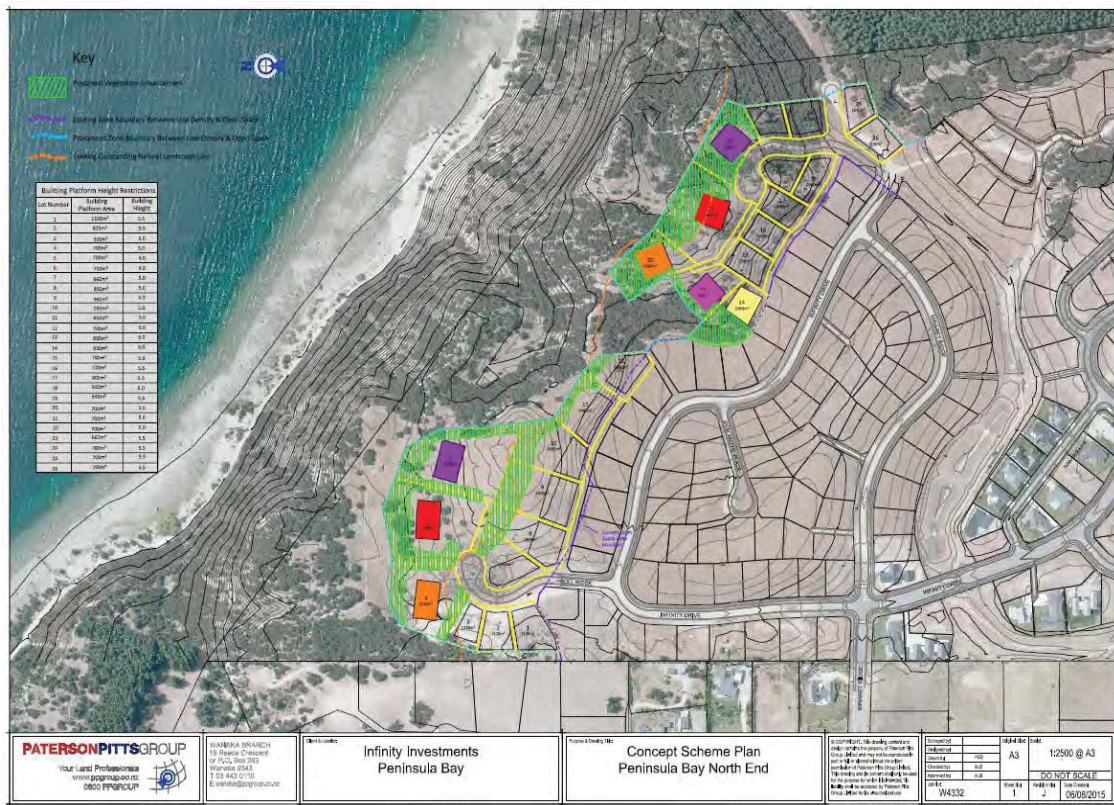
Proposed Scheme Plan including building platform locations, height and future building heights.
